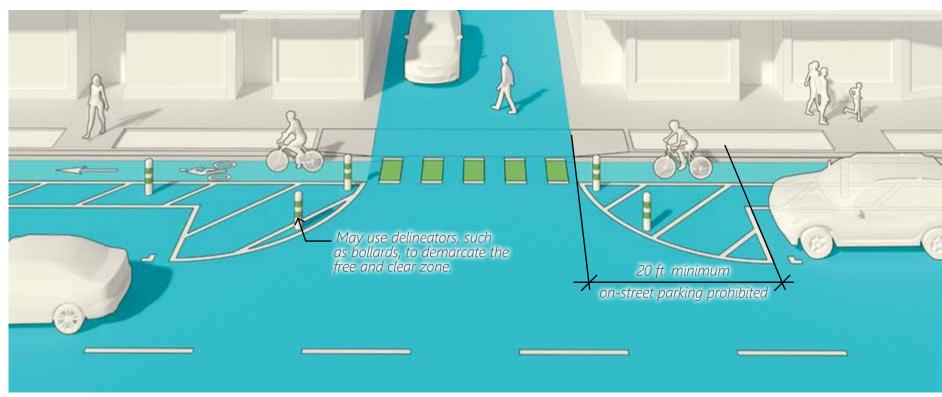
In-Street, Class IV Bikeway, Protected by Bollards and On-Street Parking, at an Alley.
